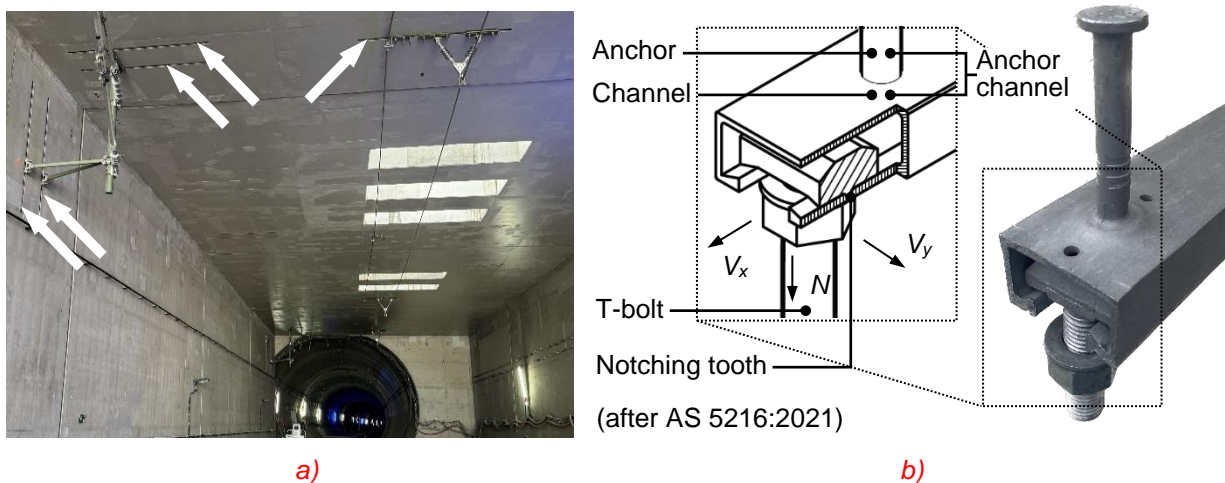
a) Anchor channels used to connect the catenary system at the 20 billion AUD railway project S21 in Germany; b) Anchor channel parts and matching notching T-bolt.
